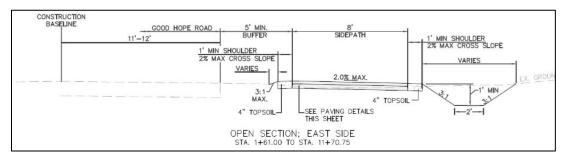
Proposed Typical Cross Section Design – East Side with Buffer
